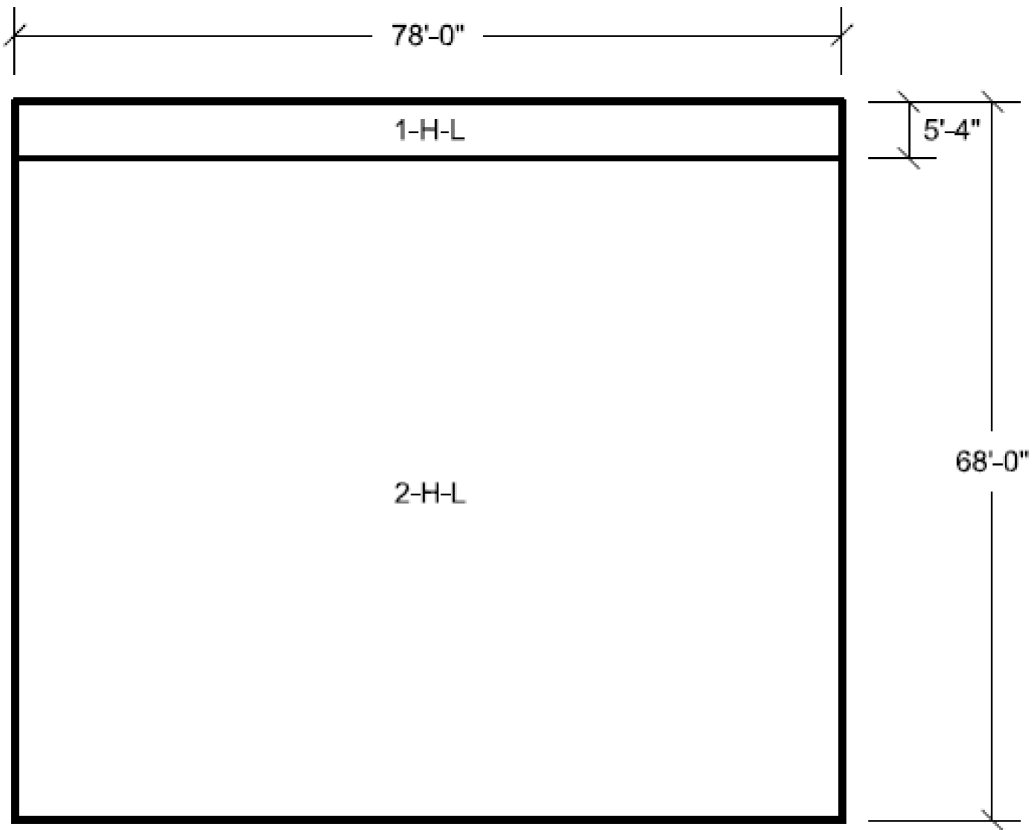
H.6-77 Pump House Internal West Wall Looking West Horizontal Reinforcement Zones Far Side Face
